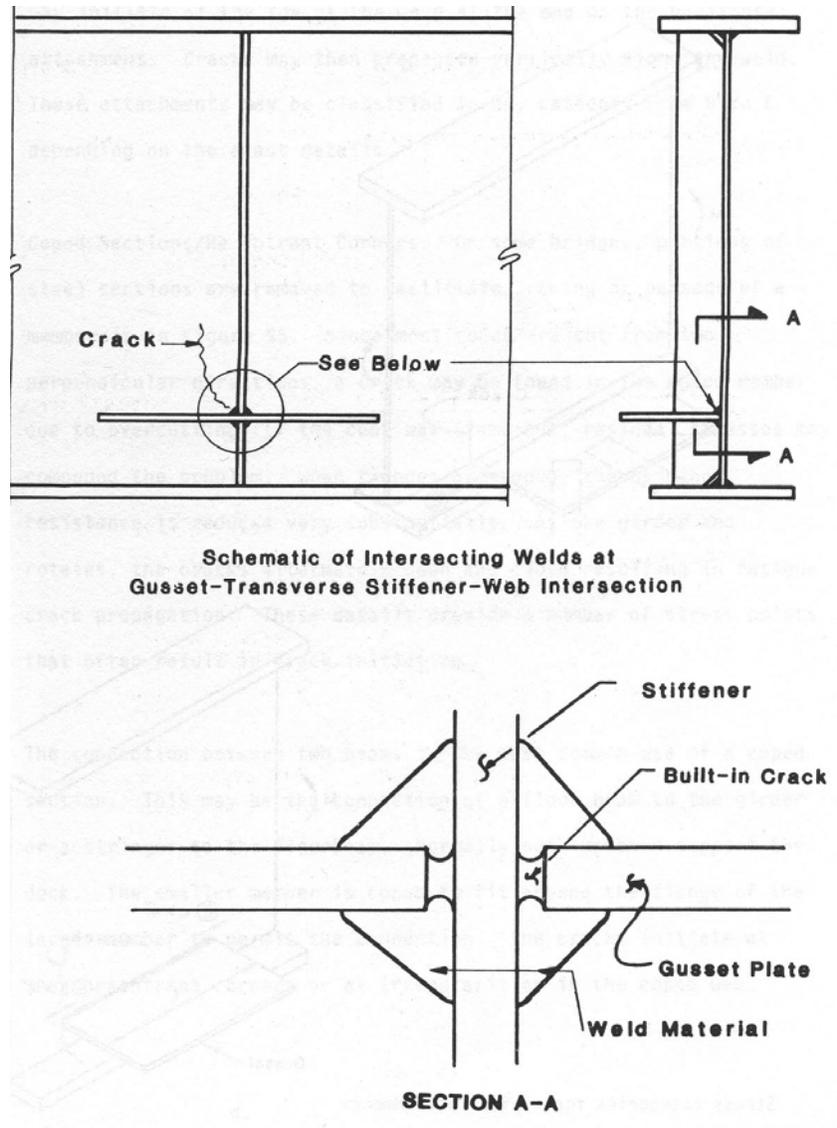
Intersecting stiffeners weld detail (Fisher 1981)
